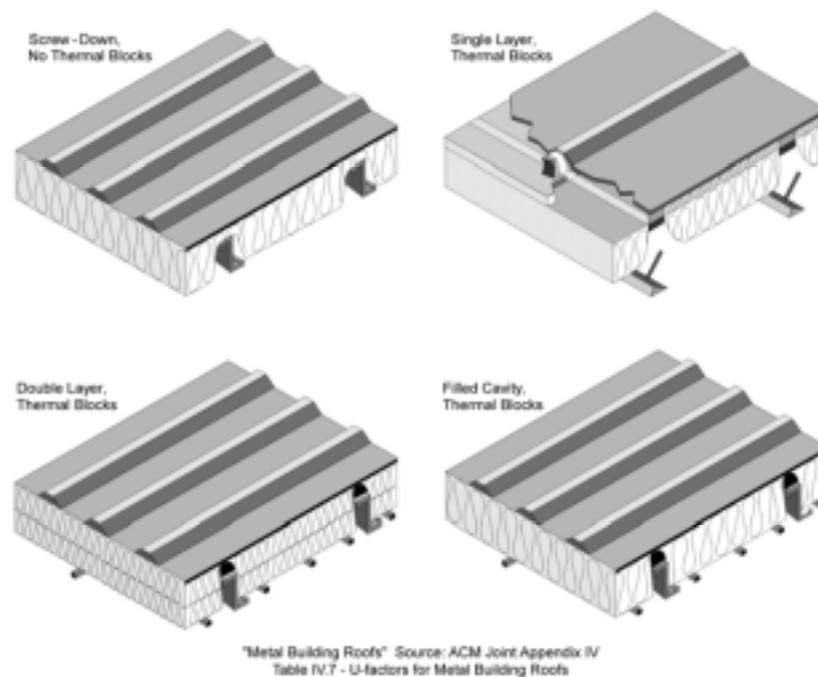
Acceptable Metal to Metal Roof Constructions
